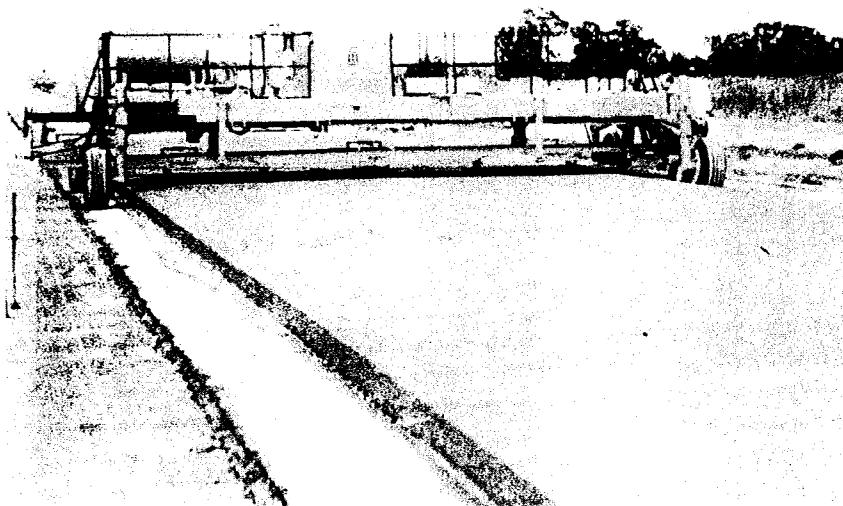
Finishing Machine Applying Longitudinal Tine Finish
